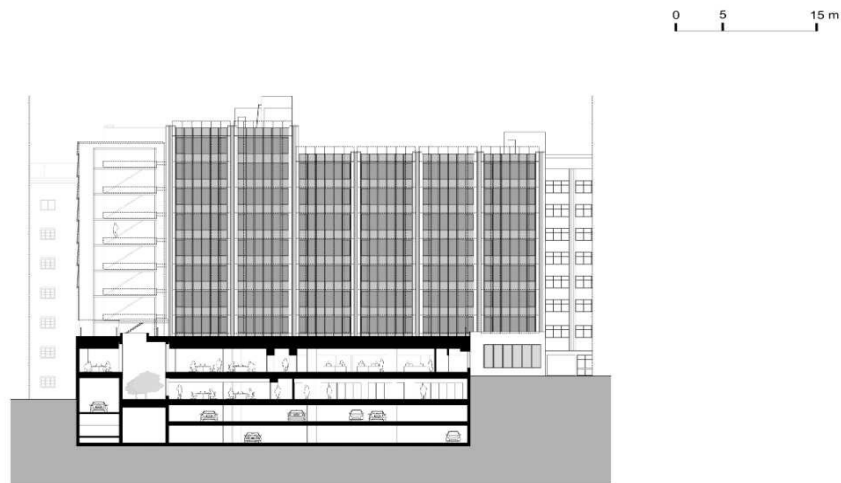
Sectional View of Telecom Office Building, Portugal Showing Underground Parking
